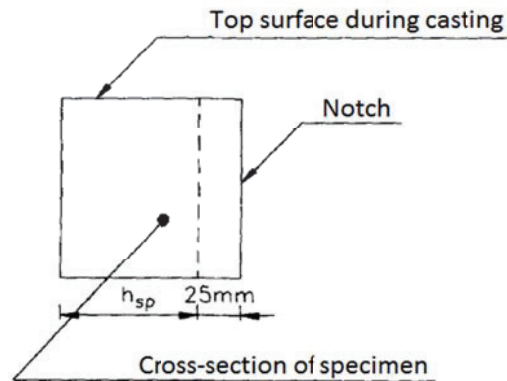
Beam cross section with position of sawn notch illustrated (Vandewalle et al., 2000)
